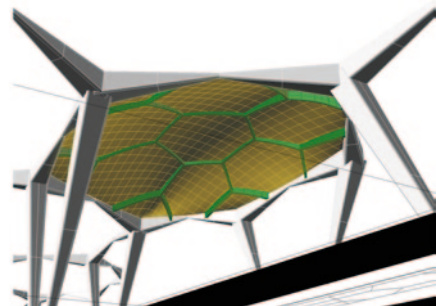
Roof construction modeled in 3D with the use of hierarchical structures
